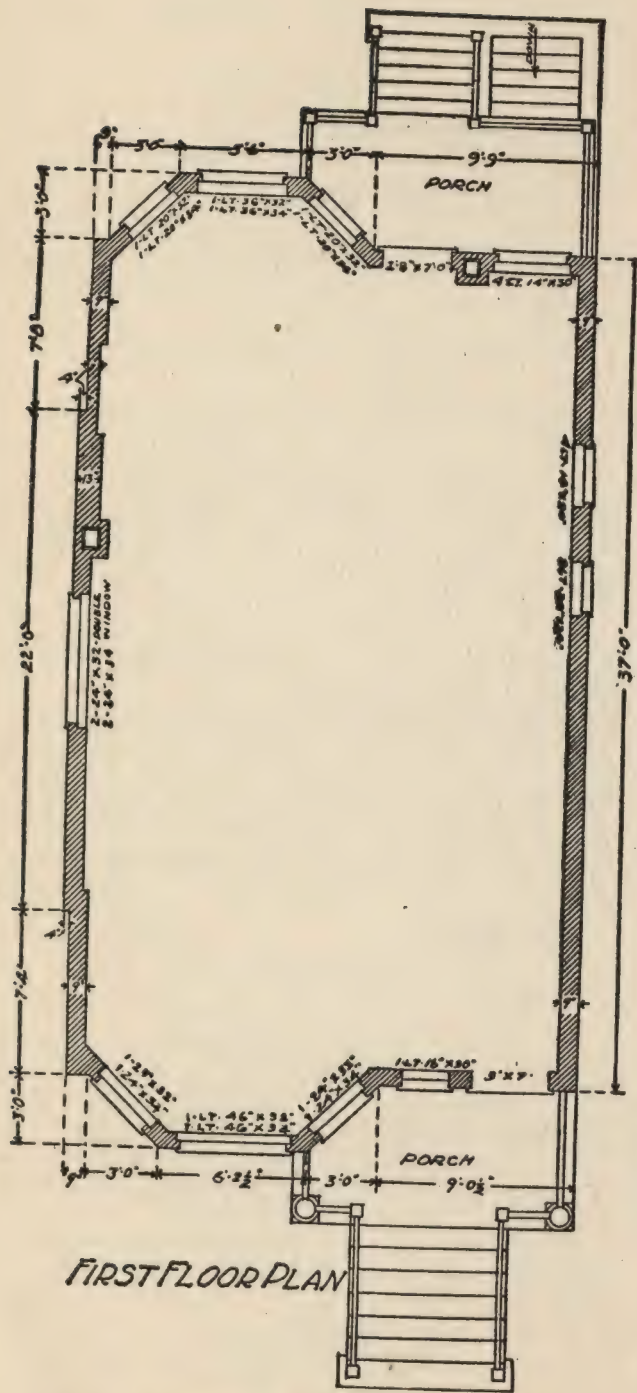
First-Floor Plan of House Shown in Figs. 62 and 64.
